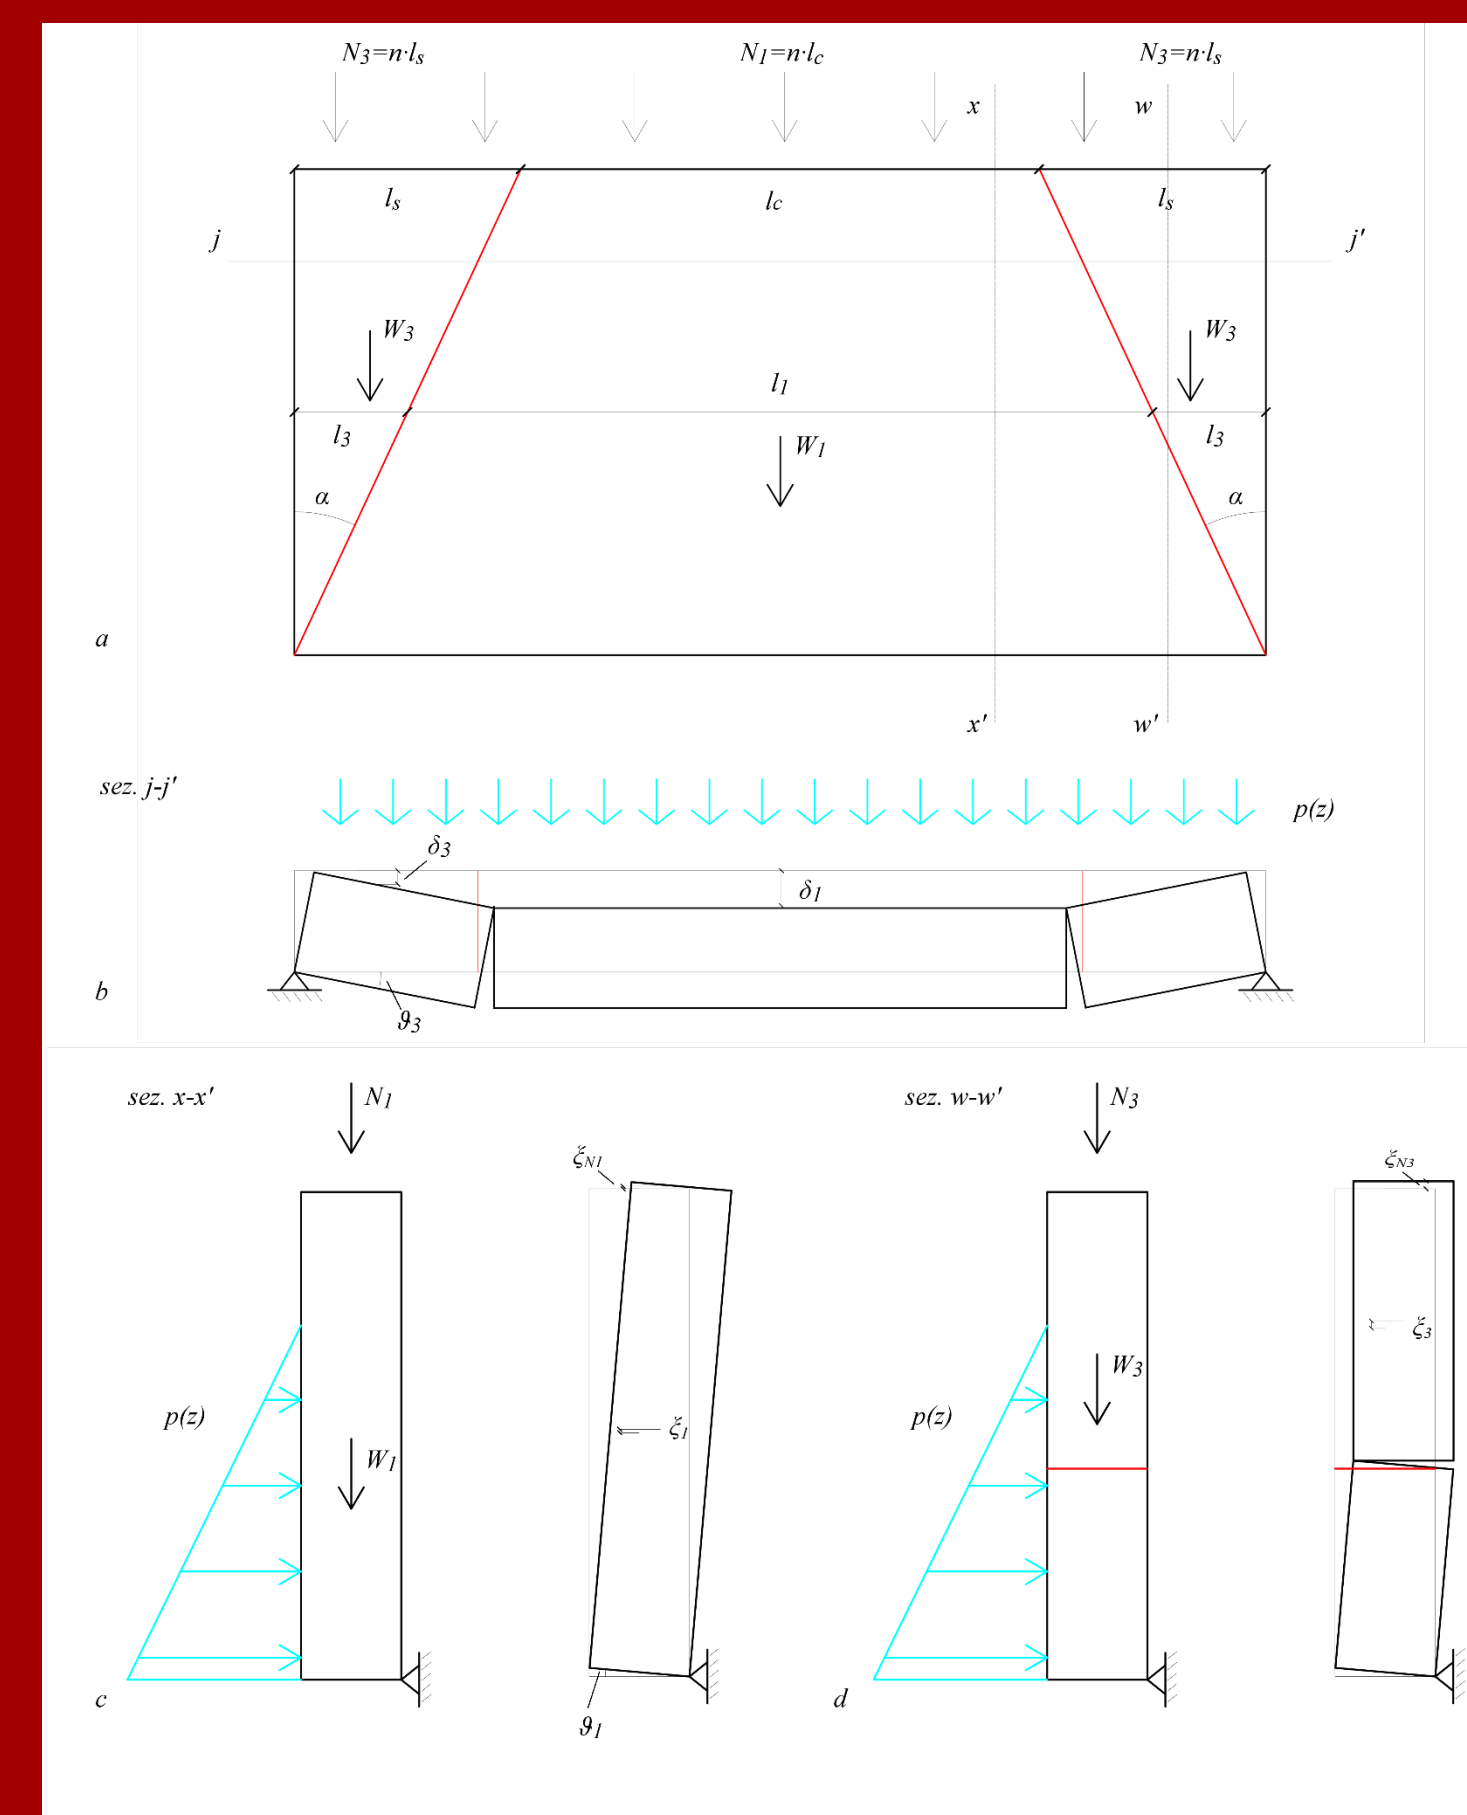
3-edges support: wall simply supported on the cross-walls and at the foundation level. Front view (a), plan cross section (b) and vertical cross sections (c, d).
